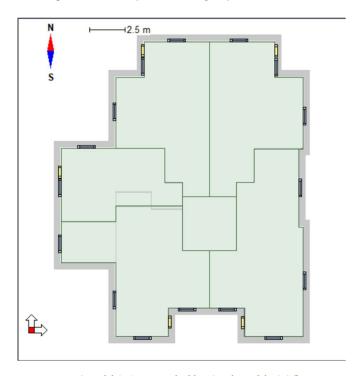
Model-2: Apartment building 2D plane of the 2-8 floors
